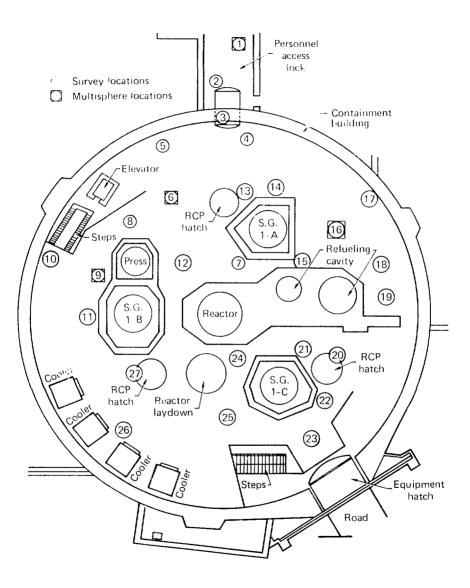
Floor Plan of the Containment at the 155-ft Level
